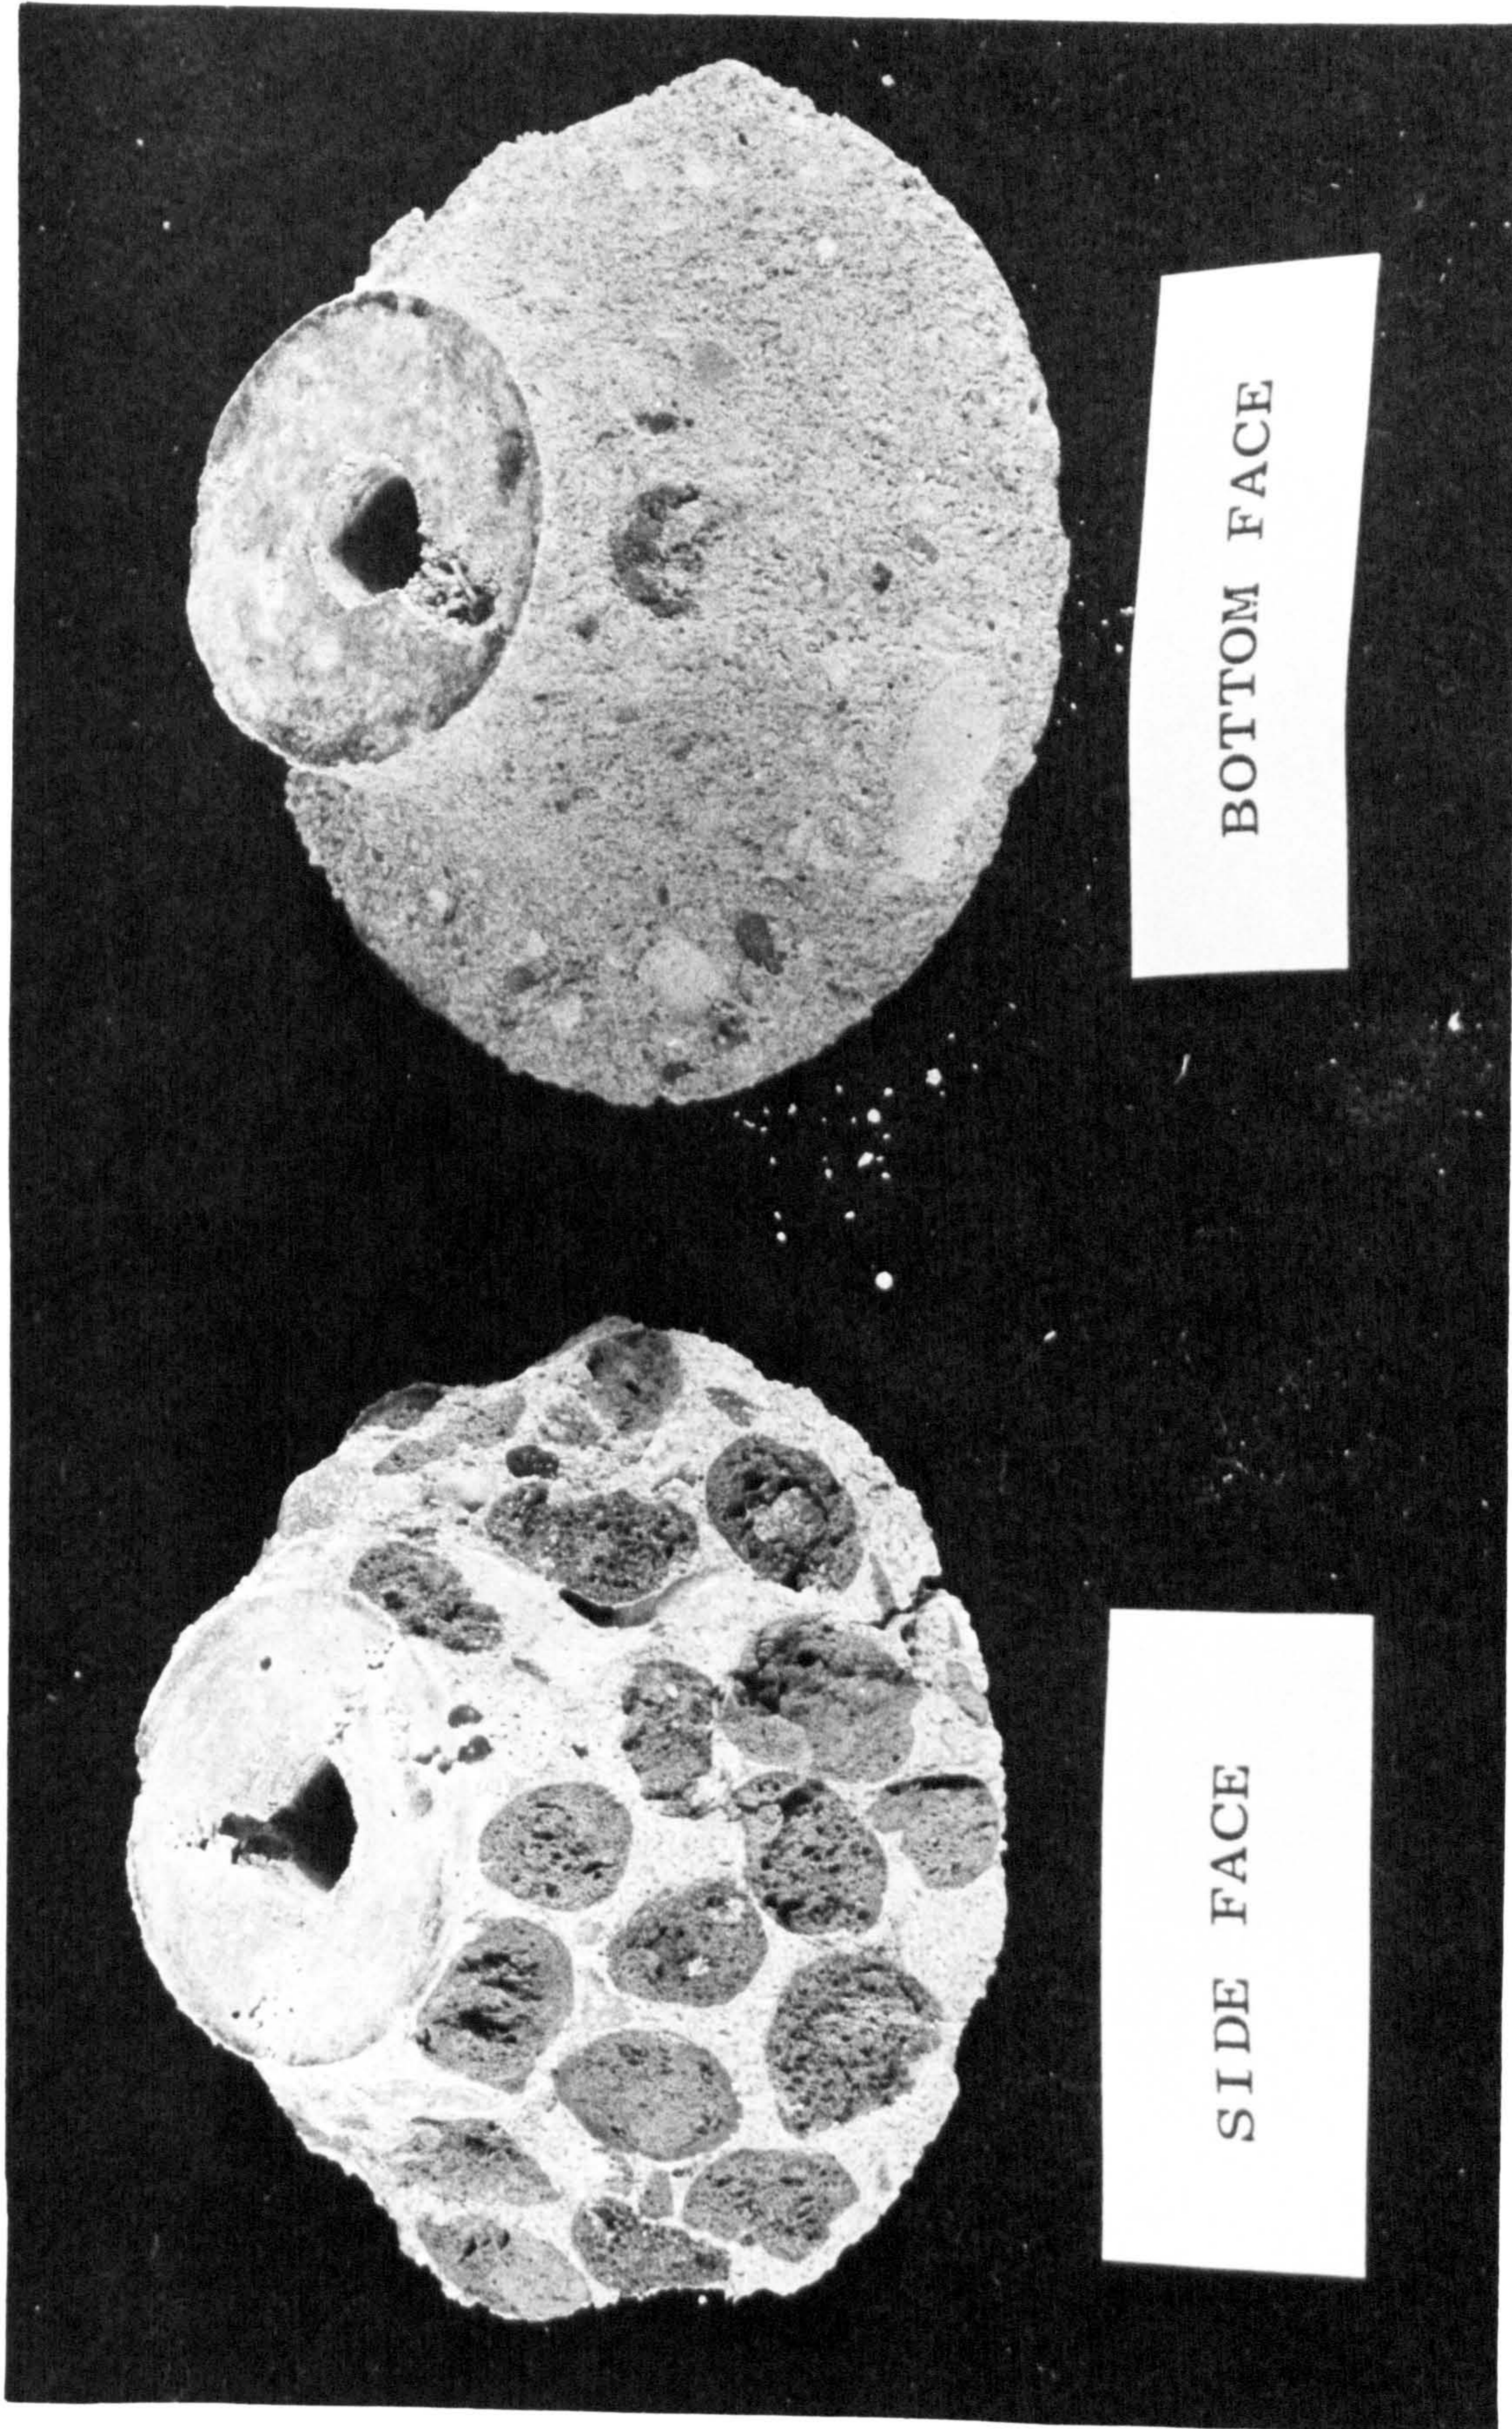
Typical pull out truncated cones extracted from side and bottom faces of a Leca concrete specimen
